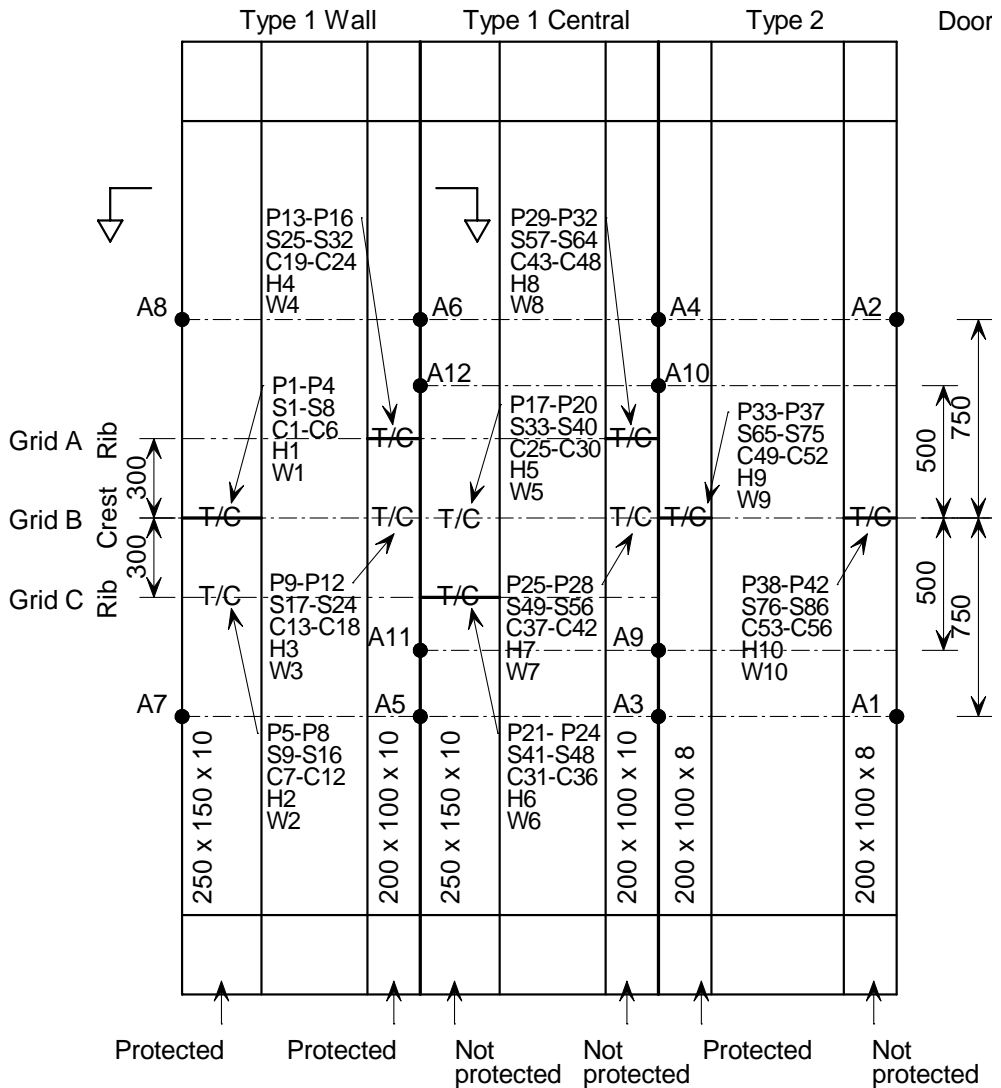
Plan showing the layout of indicative specimens on the furnace for Test WFRC 65514.
